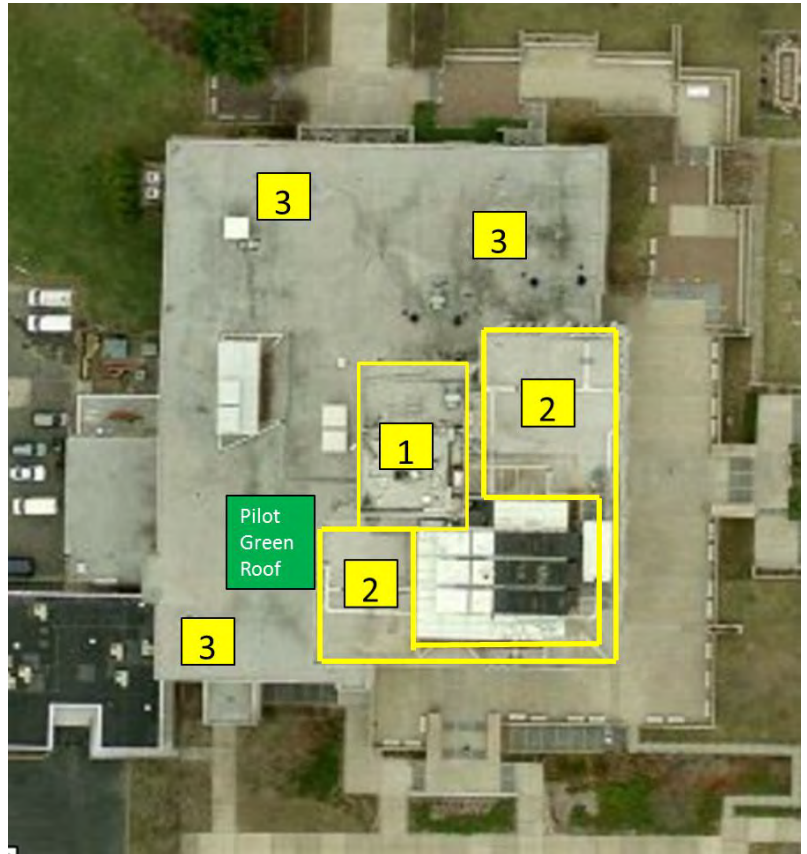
Roof of H. Lee Dennison Building with pilot green roof.
